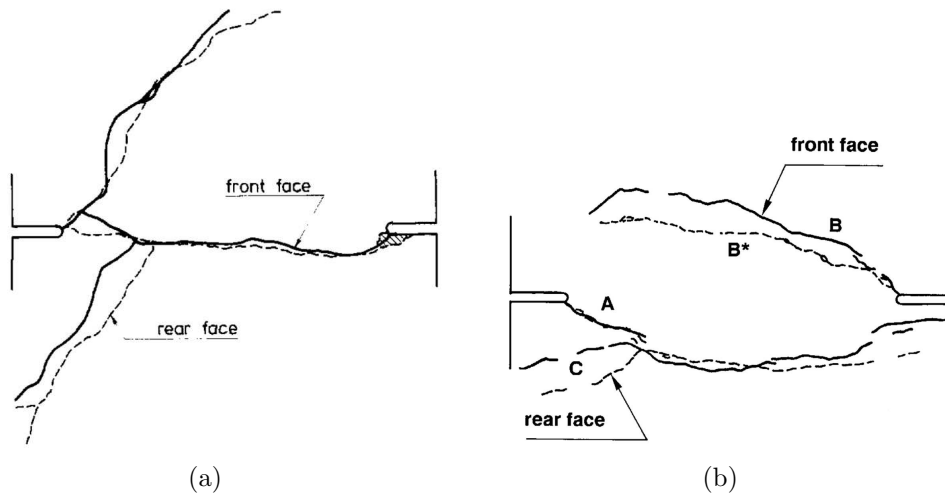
Crack patterns reported by Nooru-Muhamed (1992). (a) After an initial opening the specimen is shear loaded at a constant crack opening. (b) An initial shear load is introduced and succeeded by an opening at a constant shear deformation.
